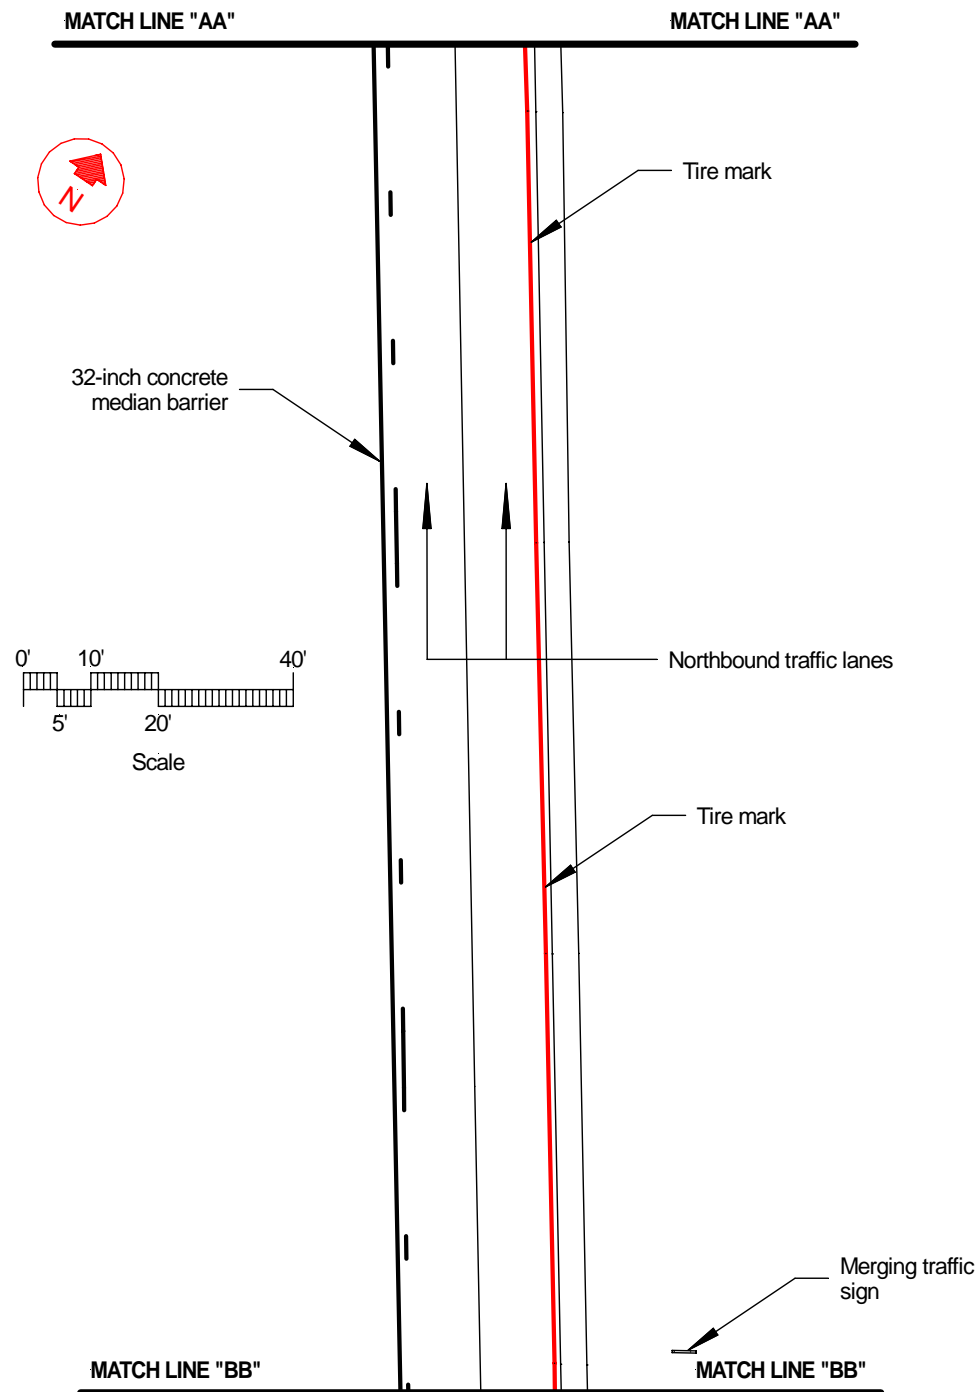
NTSB map of AA-BB pavement markings and roadway evidence.
